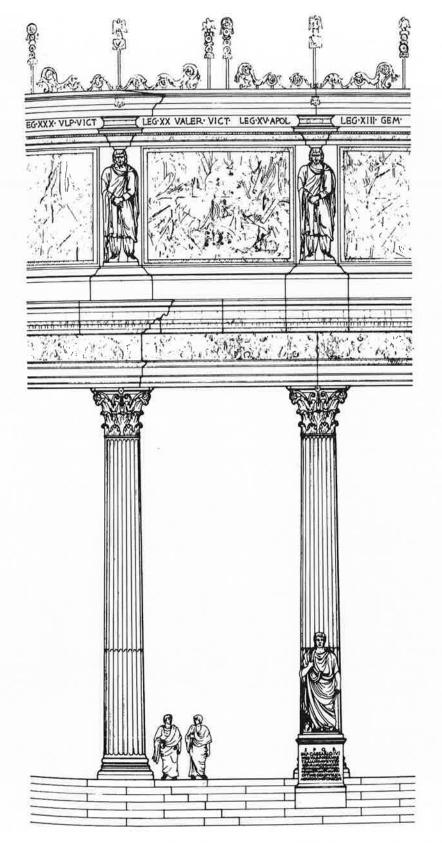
Forum of Trajan, Basilica Ulpia, facade, detail (reconstruction: Packer, American Journal of Archaeology XCVI, 1992, p. 159, fig. 3). Photo: Bryn Mawr College.
